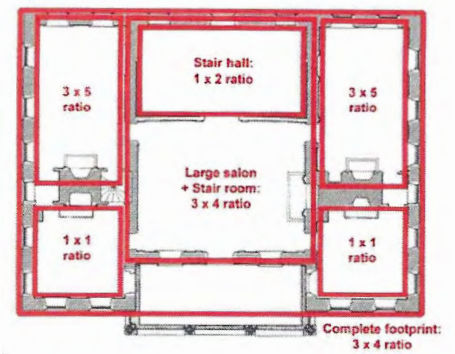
The floor plan of Drayton Hall incorporates four of Palladio's seven preferred room shapes.
